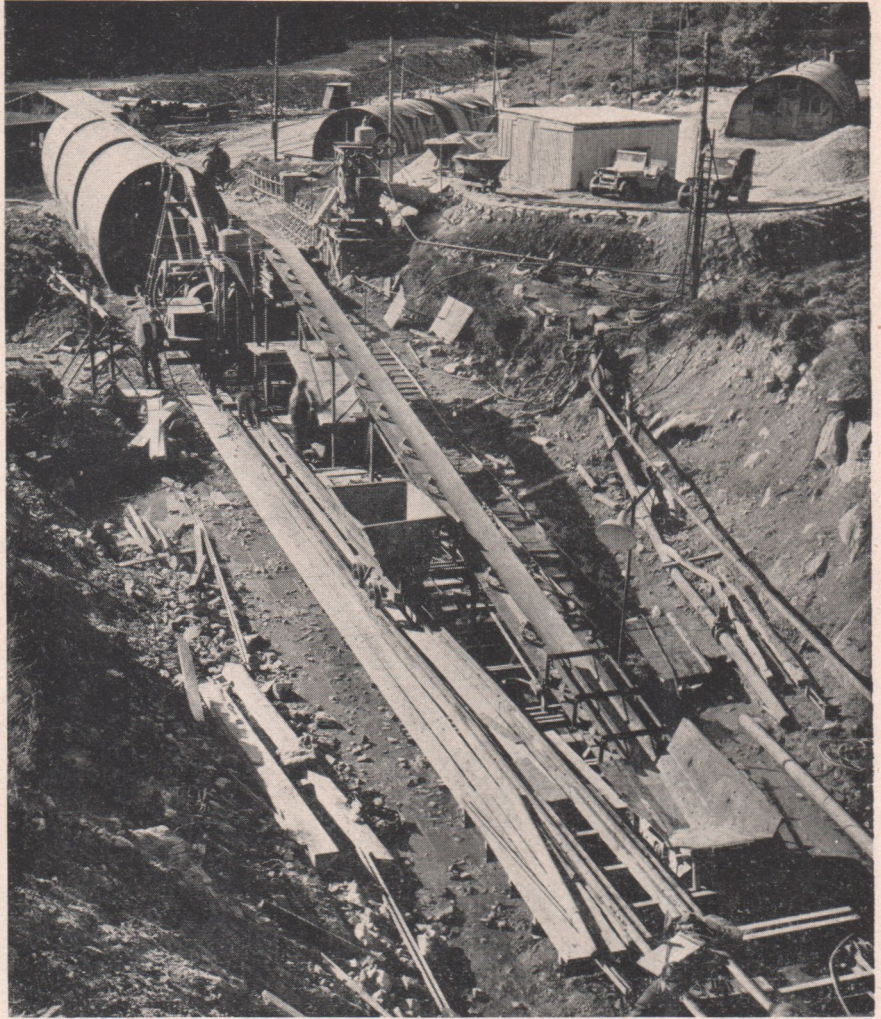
Travelling shutter, Pressweld placer and concrete plant assembled outside the Fasnakyle tunnel
